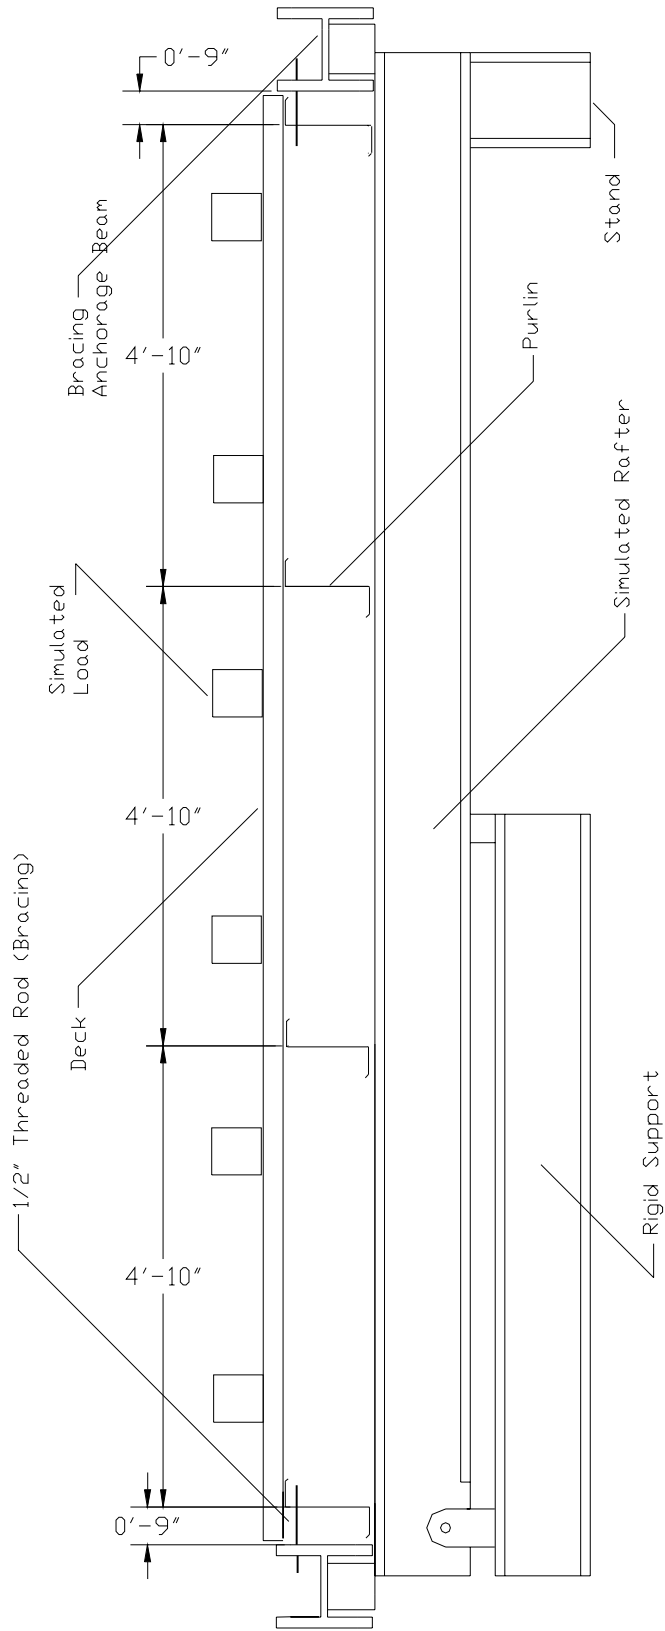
Typical Rafter Support Used for 4 Purlin Line Tests.
